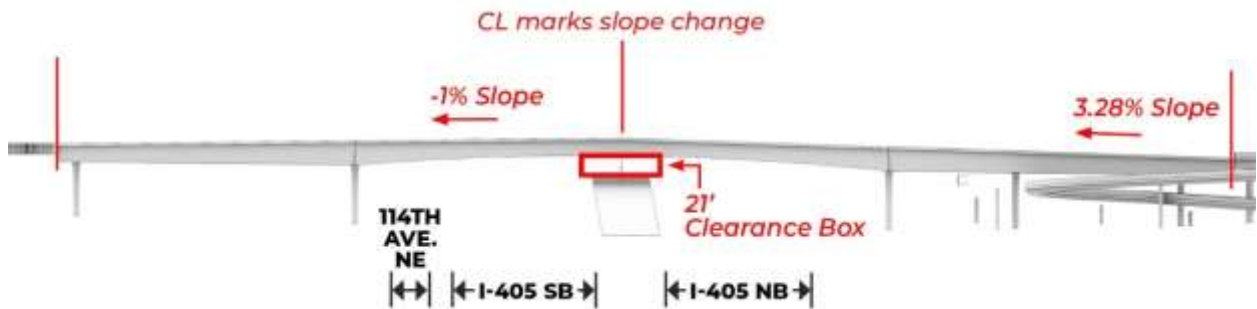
Elevation of CIP PT box girder I-405 span alternative (looking north).
